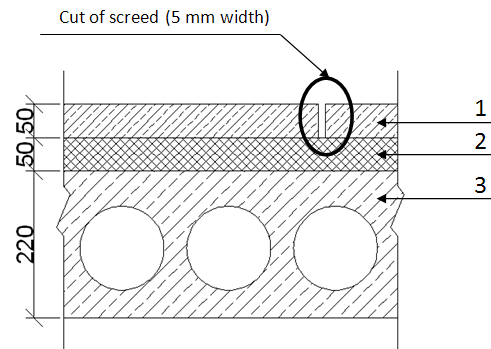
Cross-section of the floating floor construction: 1 - sand/cement screed; 2 - resilient material layer; 3 - hollow reinforced concrete slab
